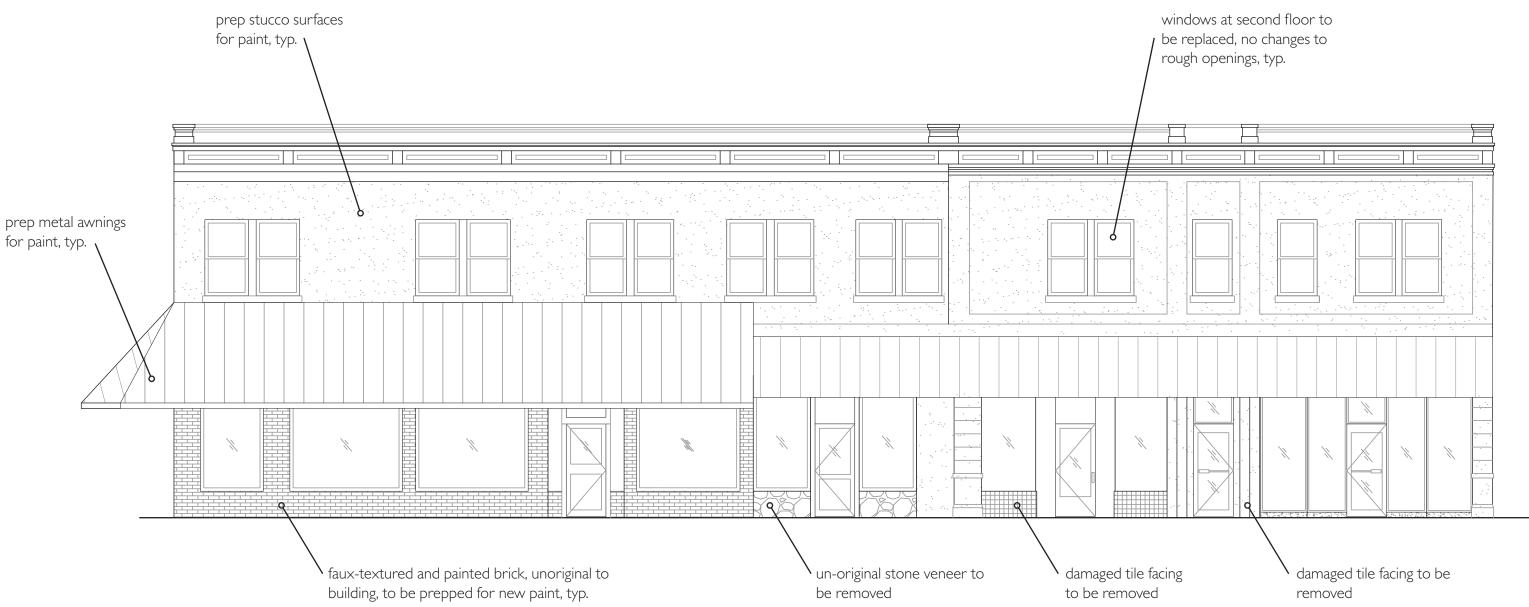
d and Washington St: Metal awnings - eaves to be closed where supporting structure is exposed and wired for bistro lights along their leading edges
